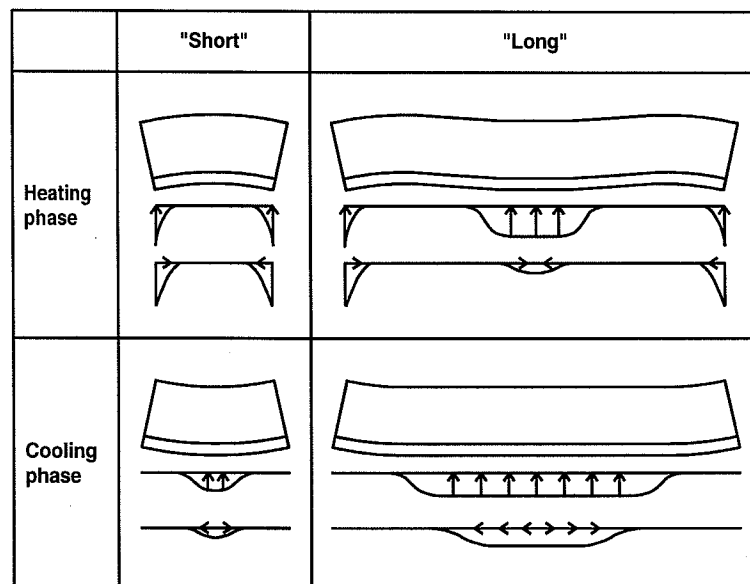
Principal reaction distributions in a tunnel seen in elevation
